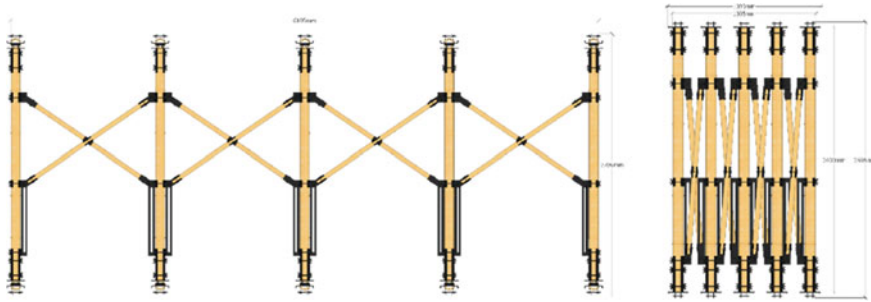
Expanded and compressed elevation of structural frame, respectively [4]
